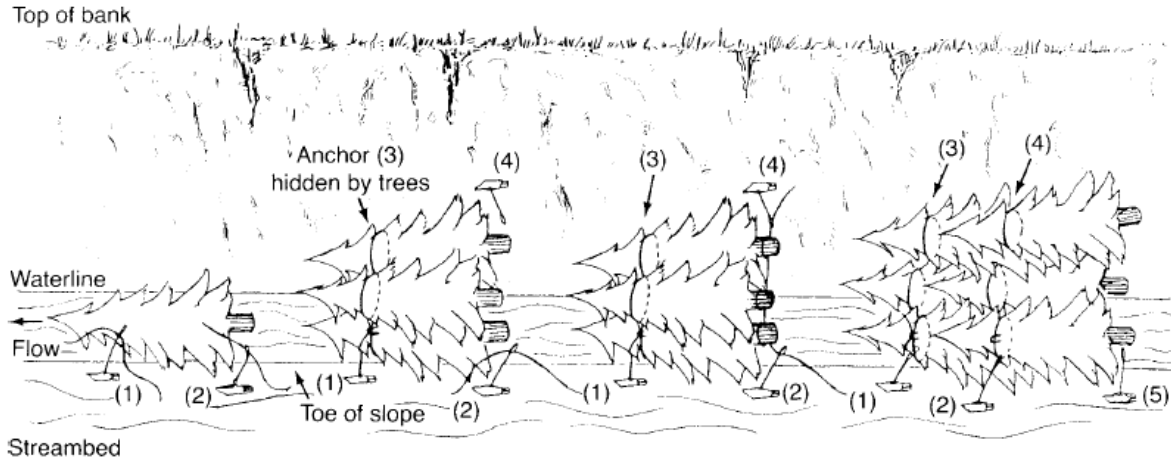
Constructing a Multiple-Row Revetment - Figure shows the general placement of cable. Cable should be wrapped around trunks only and not the outside branches. Compress the trees, pull the cable together as tight as possible and clamp tightly.
